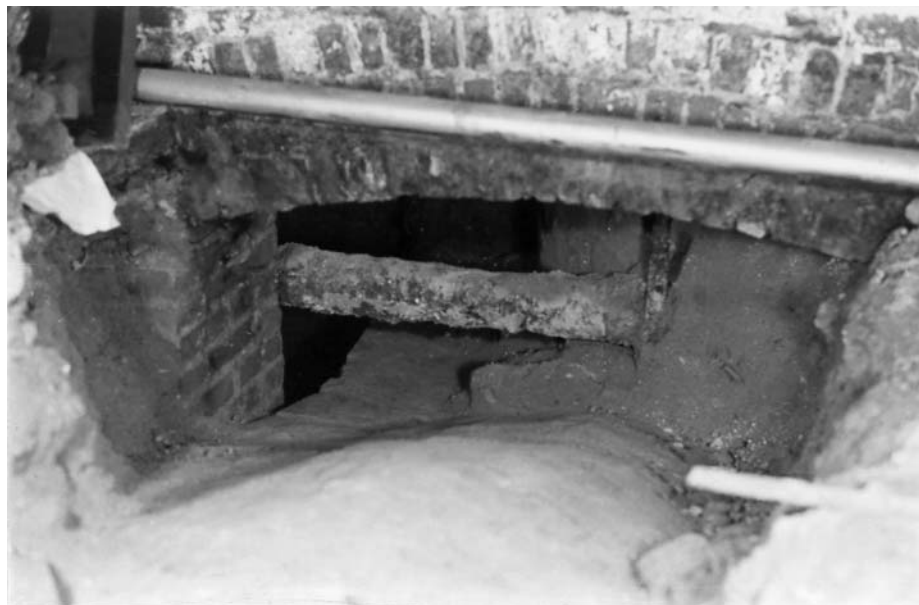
Area F, Yoh Building, Room C; close-up of surface of brick conduit, Feature 3, passing under the west wall and archway separating Rooms B and C; view west.
